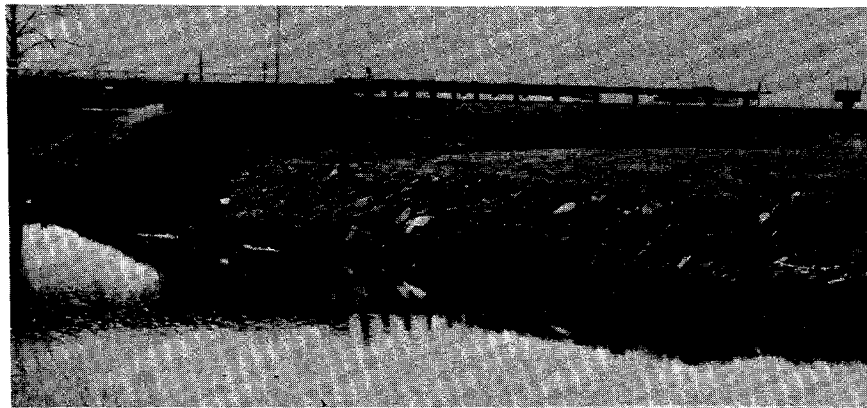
View in 1977 of broken concrete used to protect right bank of channel.
